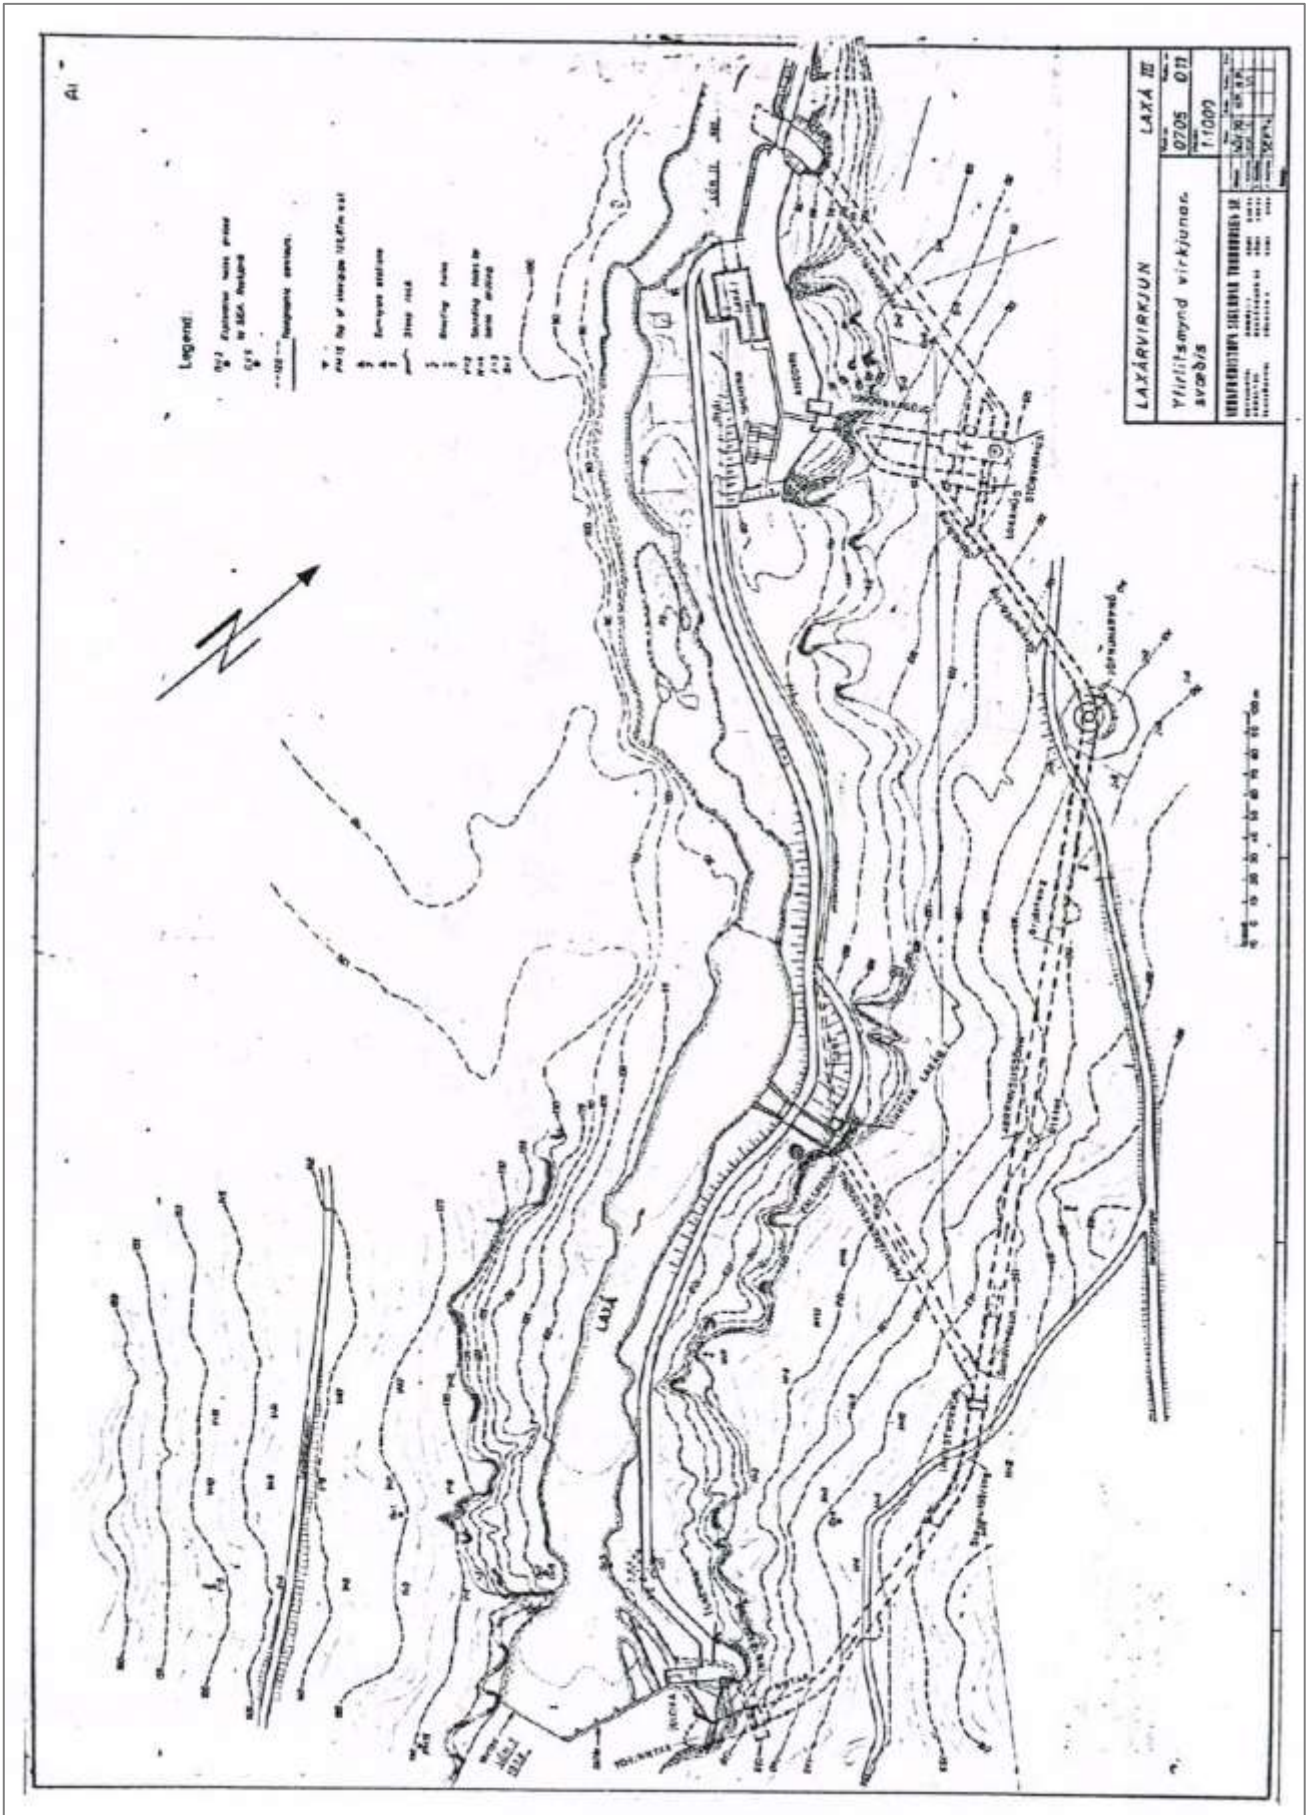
General layout of Laxá 1 and 3 Hydropower Plants (Ref. 2)
